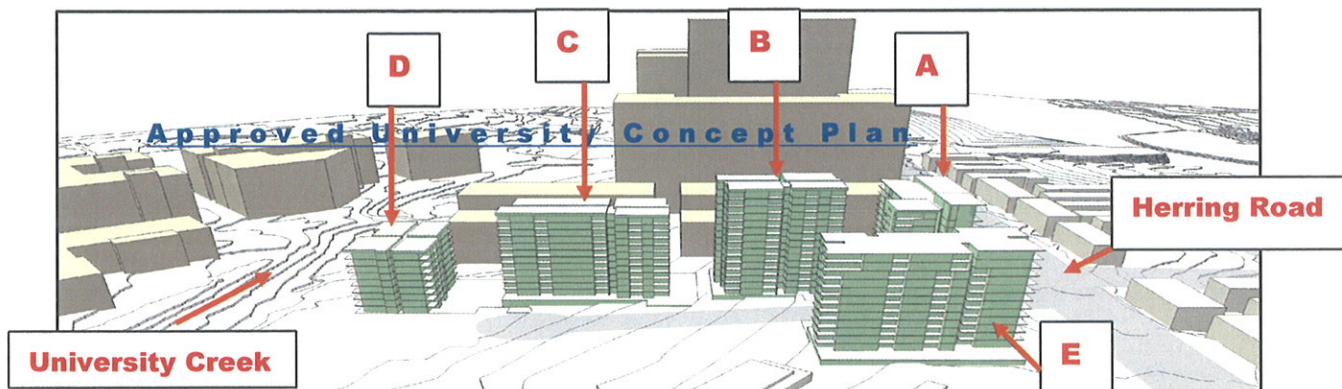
Aerial view (south-west elevation) (Source: PPR October 2010)
